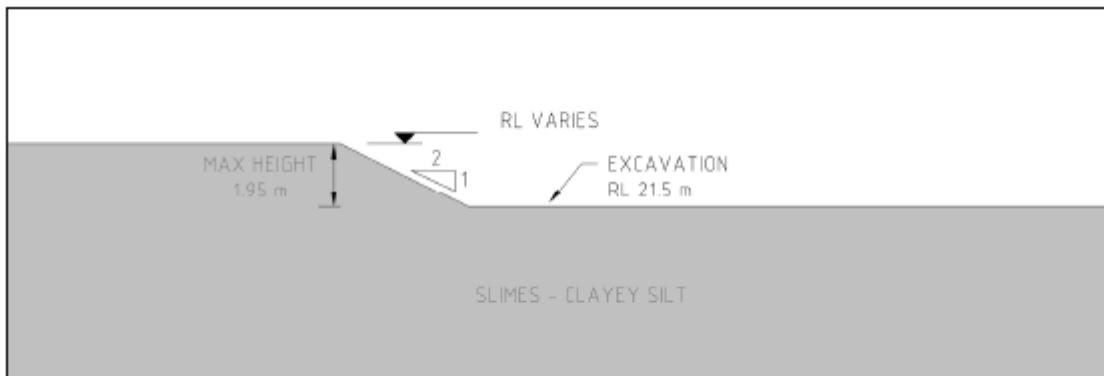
Solar drying pond (In-pit Tailings Facility)
